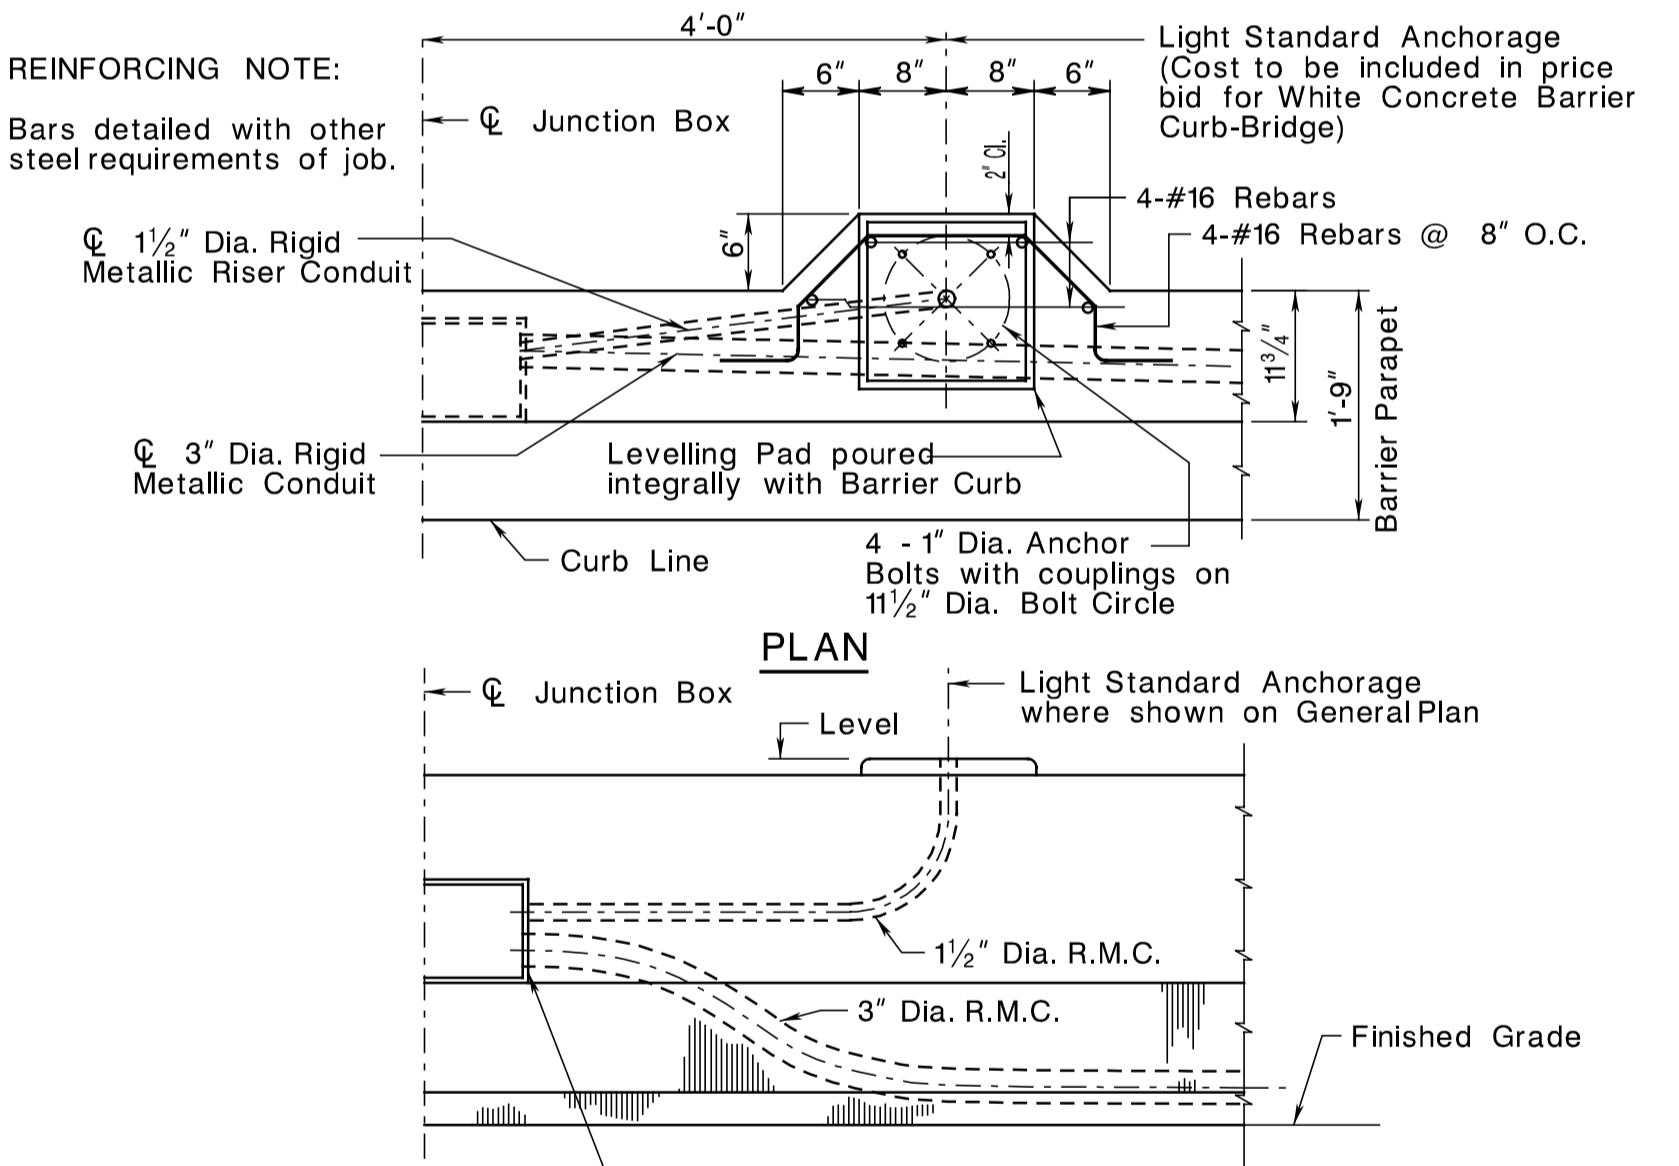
DETAILS OF LIGHTING STANDARD BOSS ON 2'-8" PARAPET
